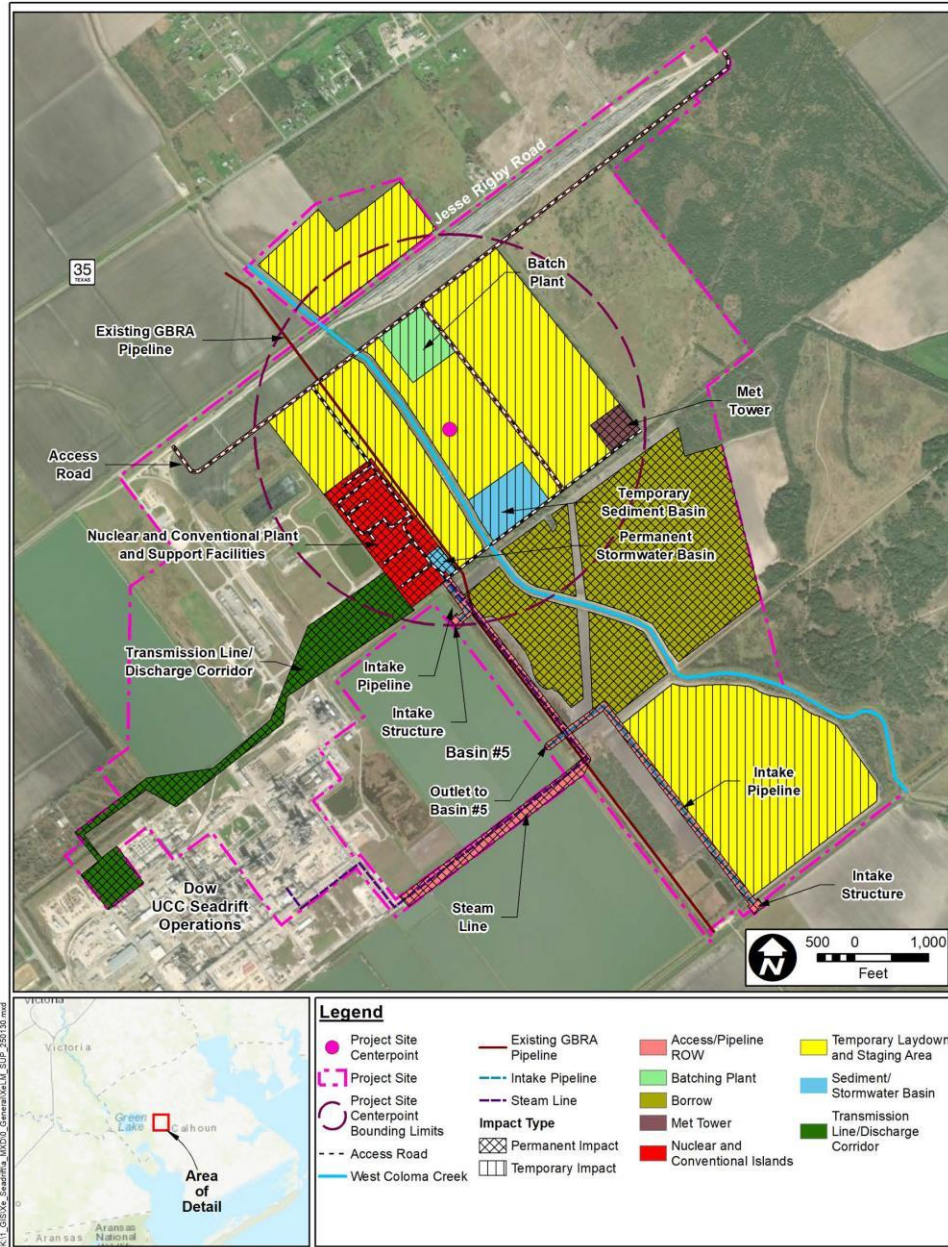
Long Mott Generating Station Site Plan. Source: LME 2025-TN12163: Figure 3.1-3.
